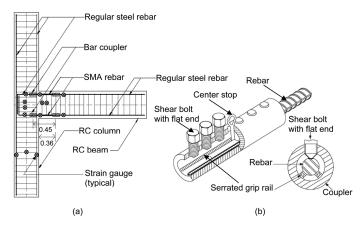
(a) Splice details of specimen JBC-2 and the positions of strain gauges and (b) regular single barrel screwlock coupler for connecting SMA rebar with regular steel rebar (all dimensions in m; 1 m = 39.37 in)
